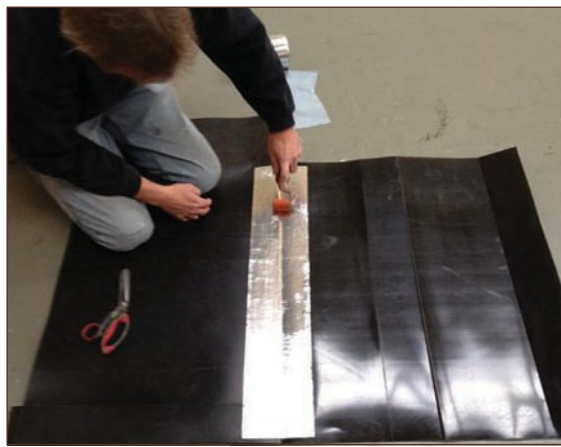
Example HDPE type gas membrane and steam roller used to ensure self-adhesive tape is correctly installed (courtesy A Proctor Group)
